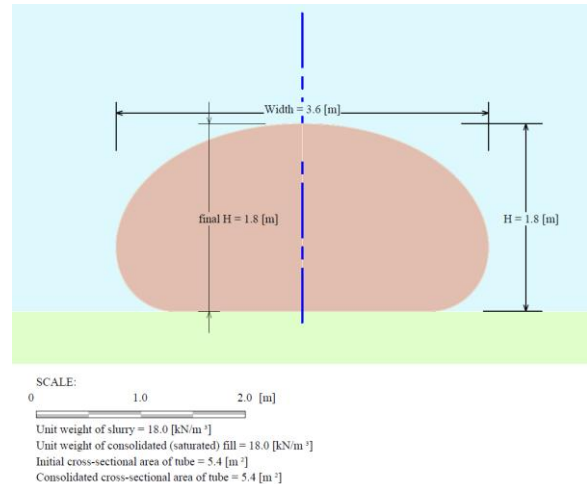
Example of geotextile tube dimensioning; cross-section; one layer filling, final filling condition
